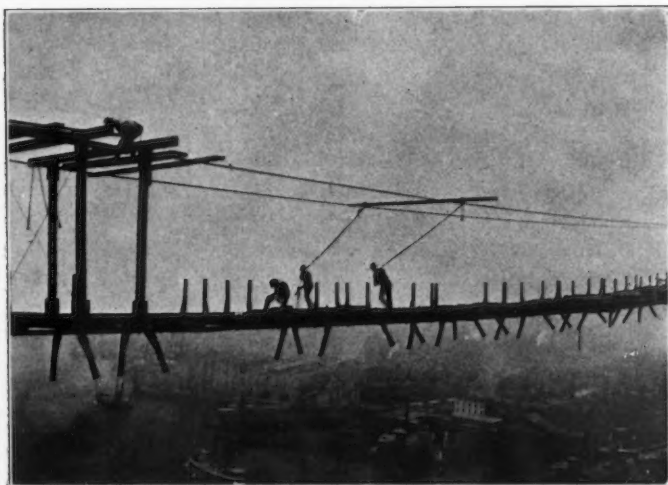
CONSTRUCTION OF UPPER DECK OF FOOTBRIDGE.
